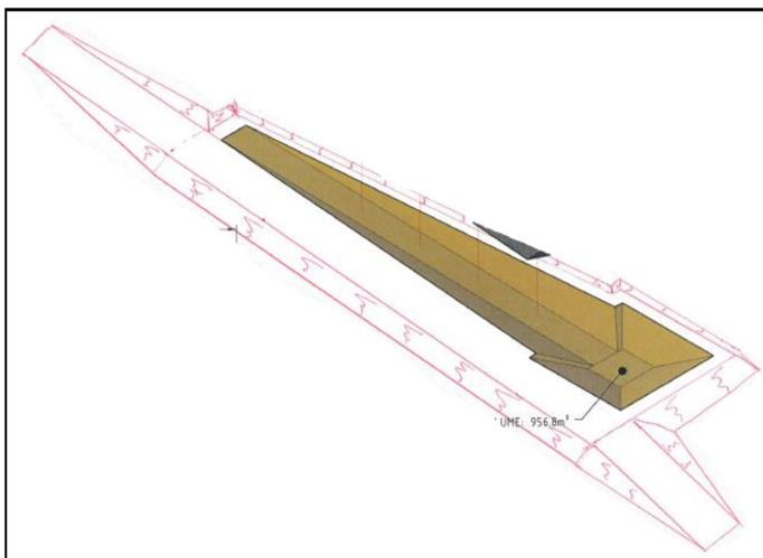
Design concept drawing of the proposed Lancefield tailings storage trench.
